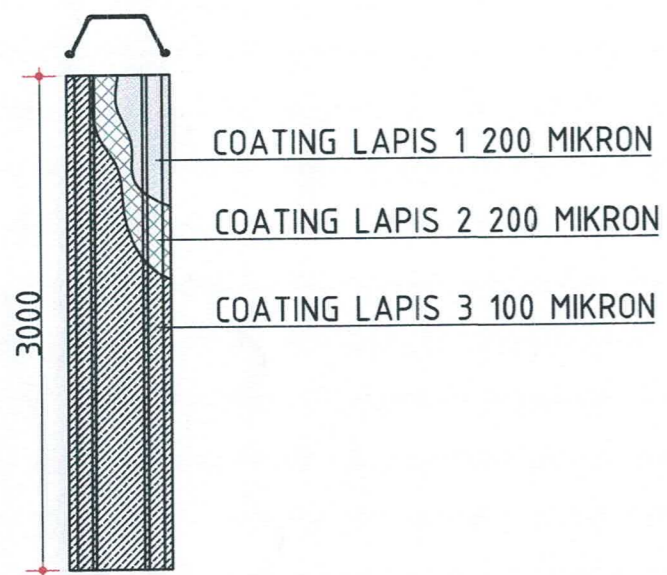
M STEEL SHEET PILE PU-22 (OT-22)
